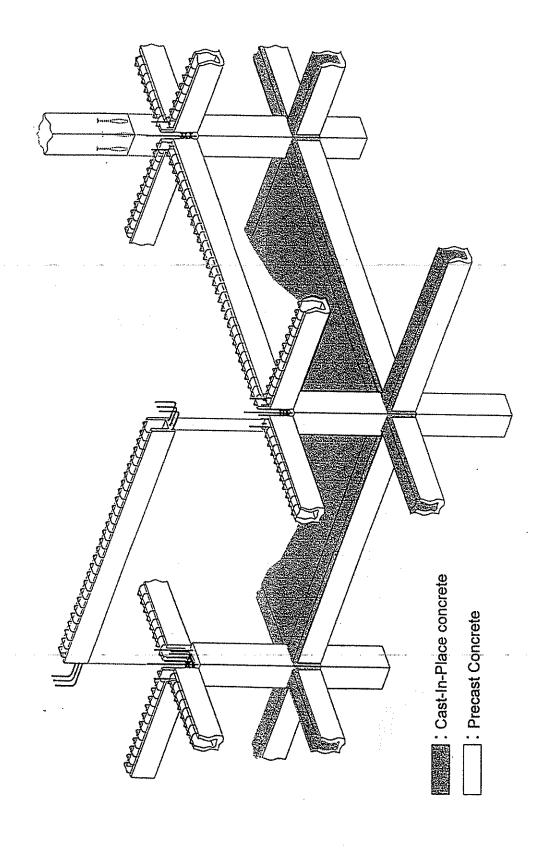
Precast Concrete System Utilizing Beam and Column Shells (Adapted from Ref. [1-22])
